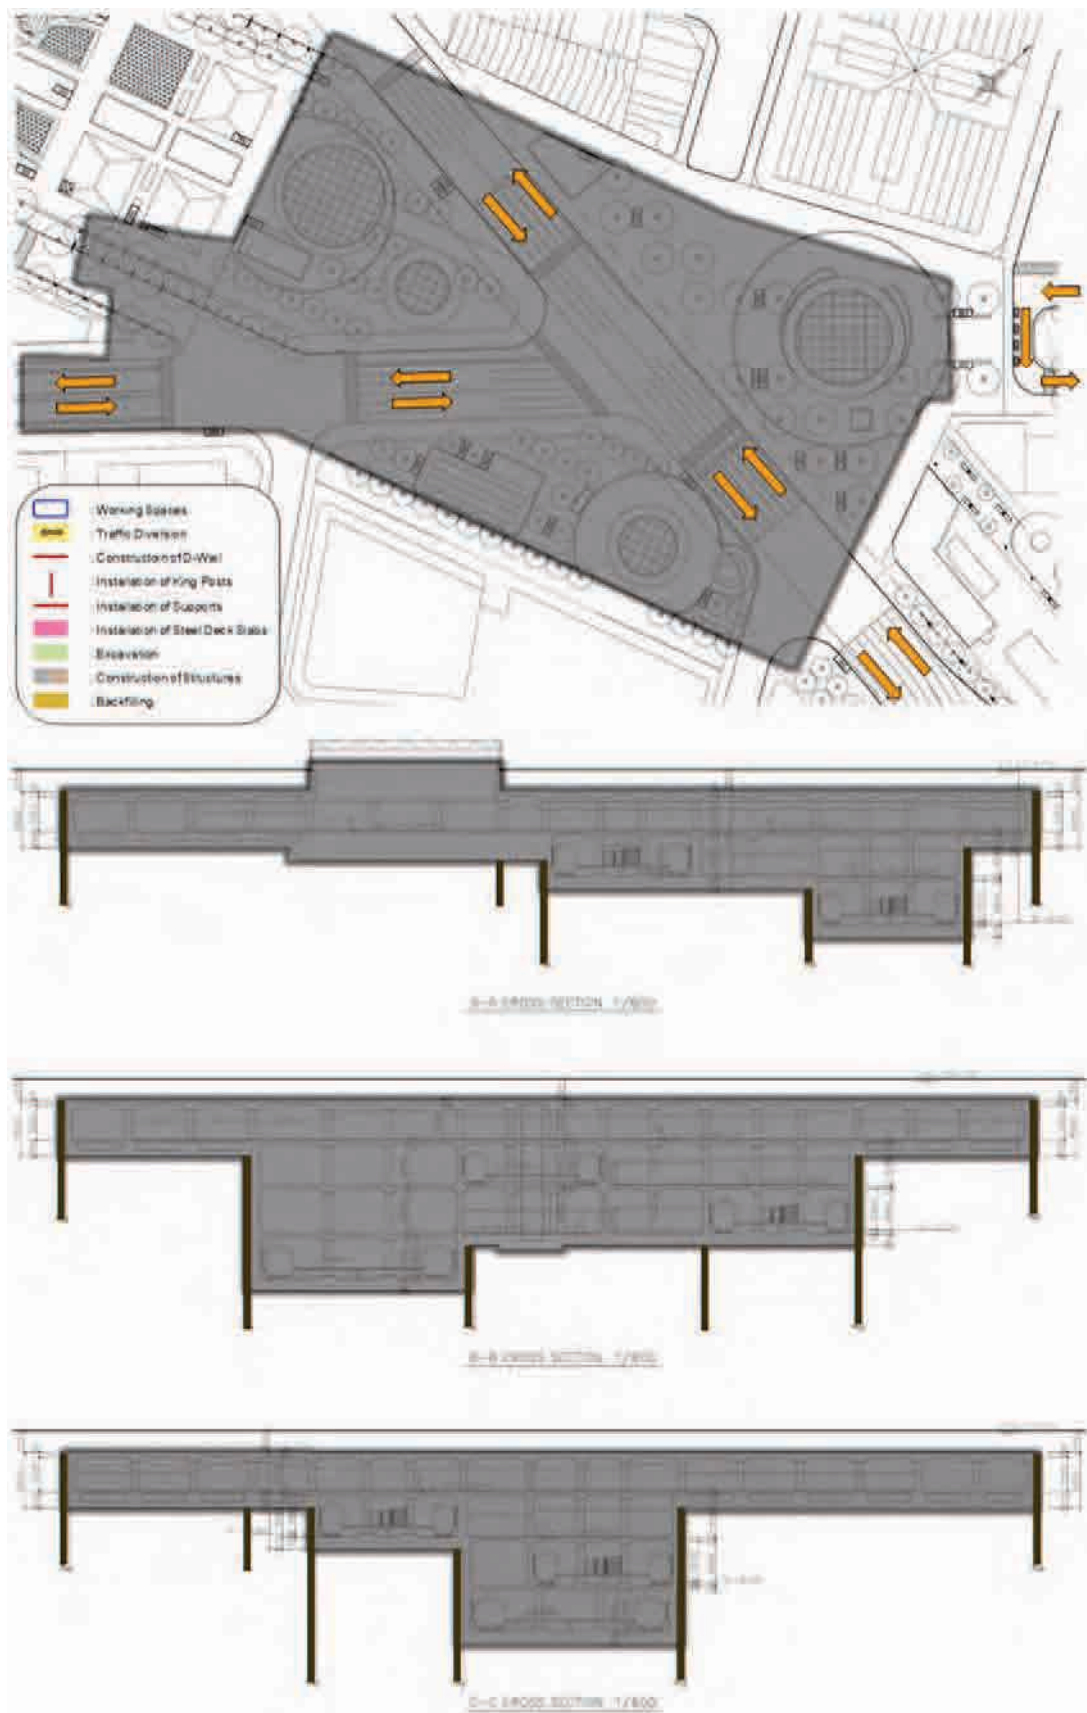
Construction Sequences of Ben Thanh Central Station (24/24)
